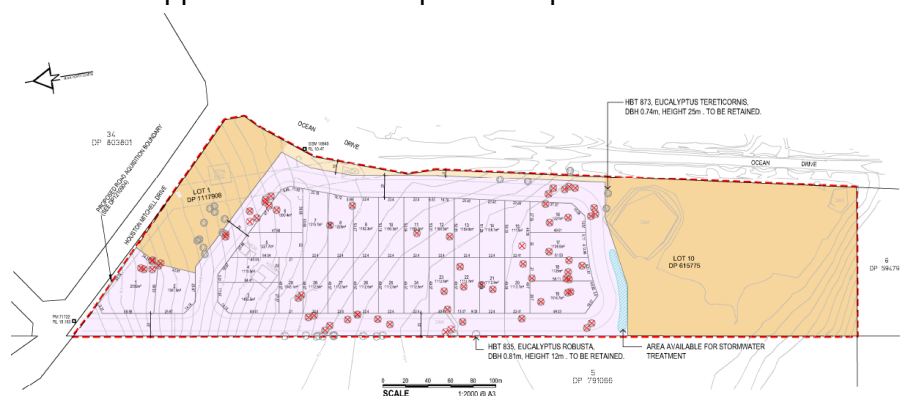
Applicant's Concept Plan and recommended zone layout (1 April 2019)
